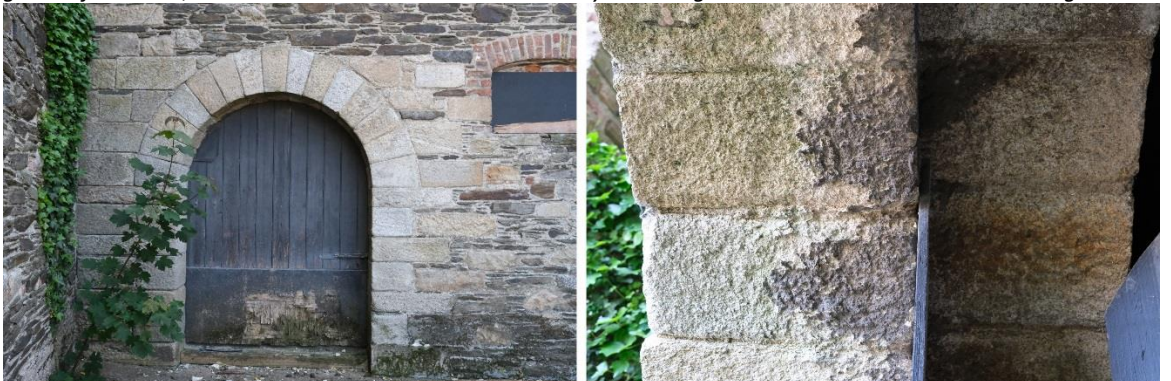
Granite arched doorway in the rear (west) elevation at courtyard level (see Fig.18).
